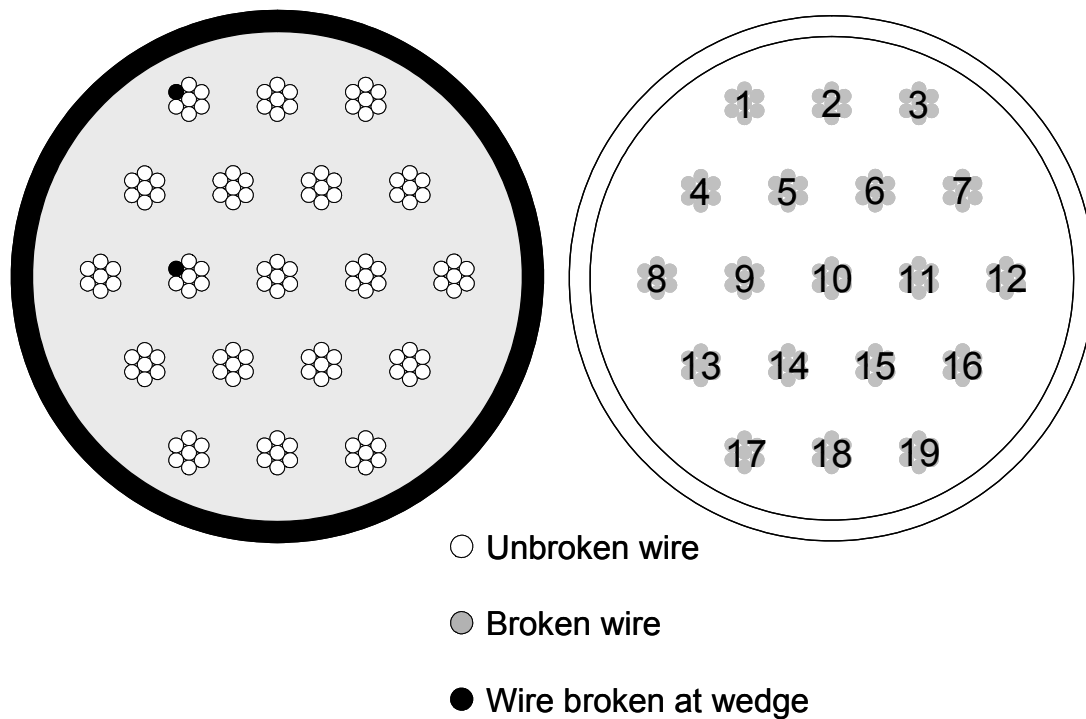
Wire breaks at the tower anchorage - Specimen 8
